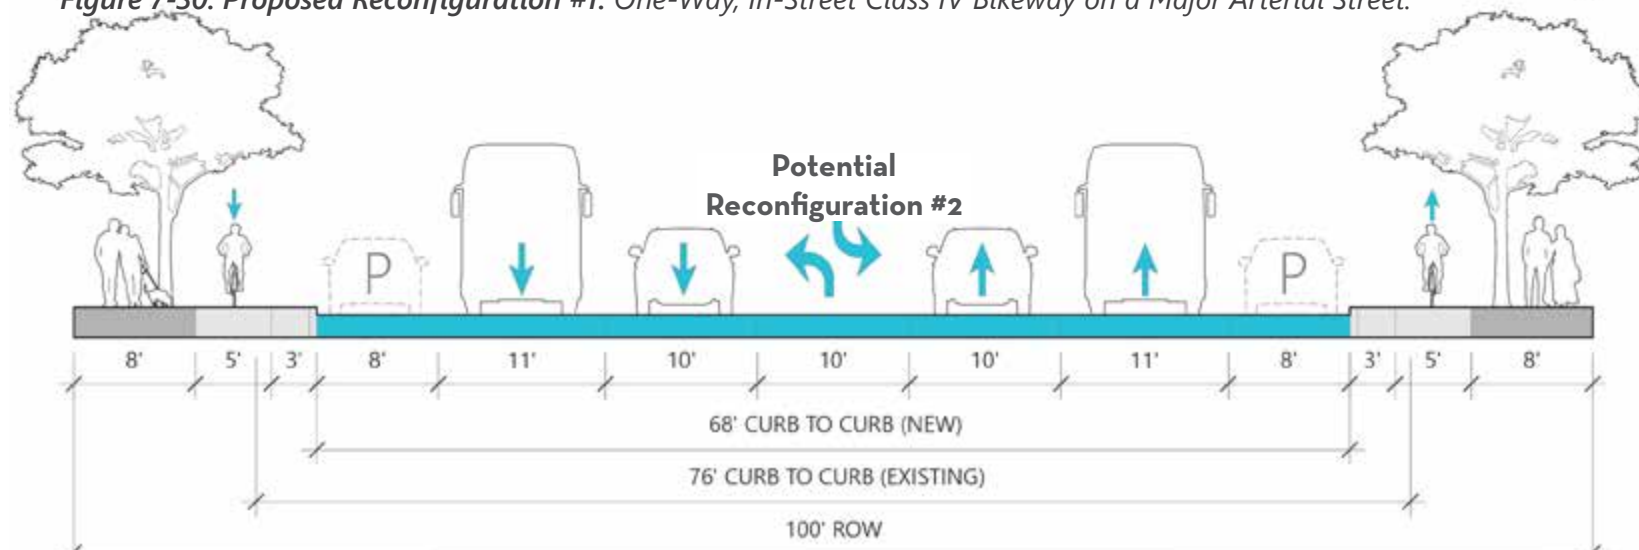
Proposed Reconfiguration #2: One-Way, Sidewalk-Level Class IV Bikeway on a Major Arterial Street.
